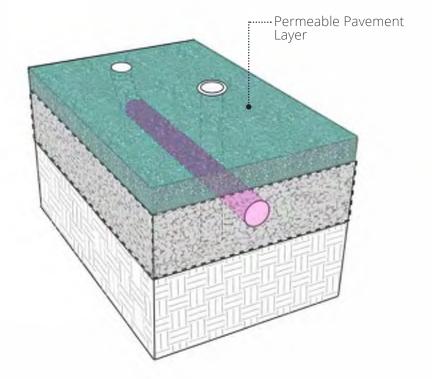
PERMEABLE PAVEMENT MAINTENANCE ZONES
